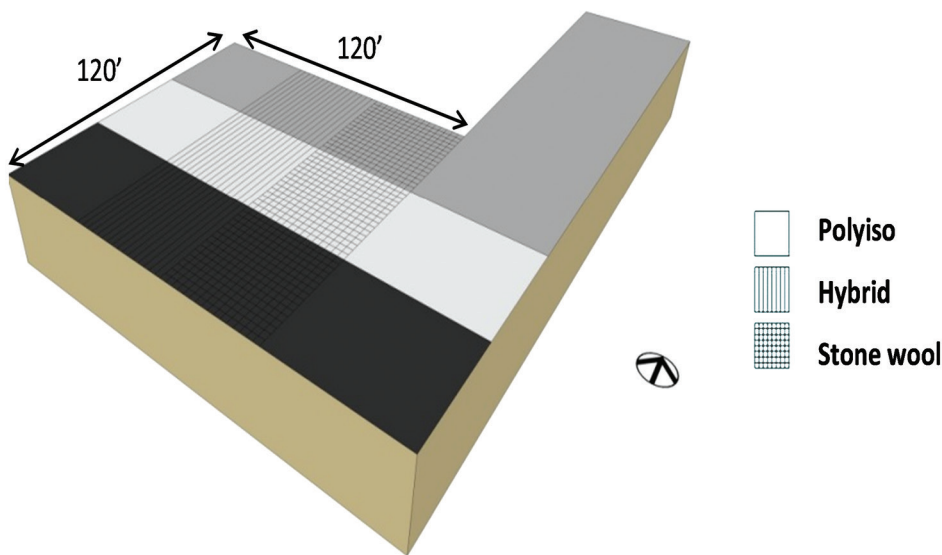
Study building and layout of roof membrane cap sheet color and insulation strategy.
